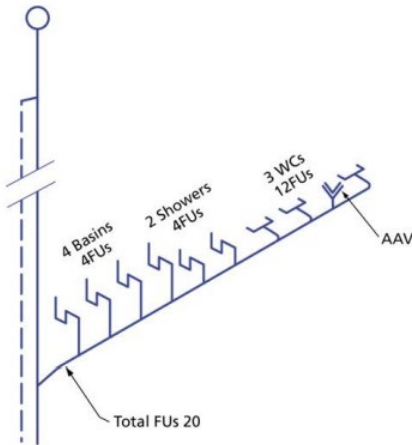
Group Ventilation: Branched Common Discharge Pipe
